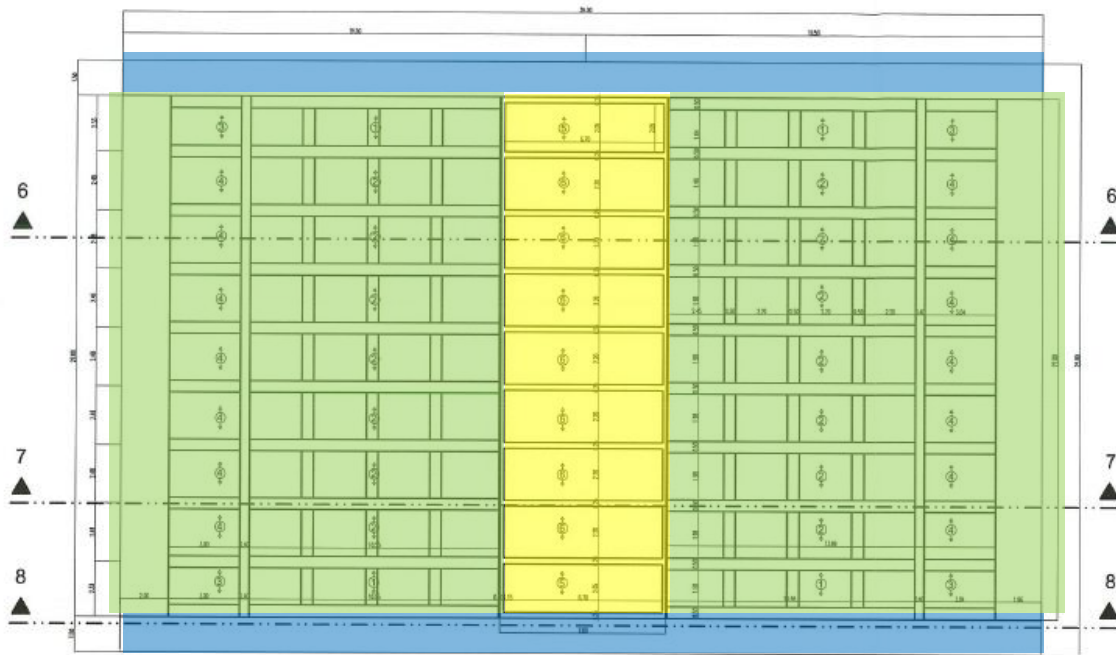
Disposition of arch cantilever slabs (green), simple beam slab (yellow) and cantilever side slab (blue) in plane of the bridge (bottom side)
